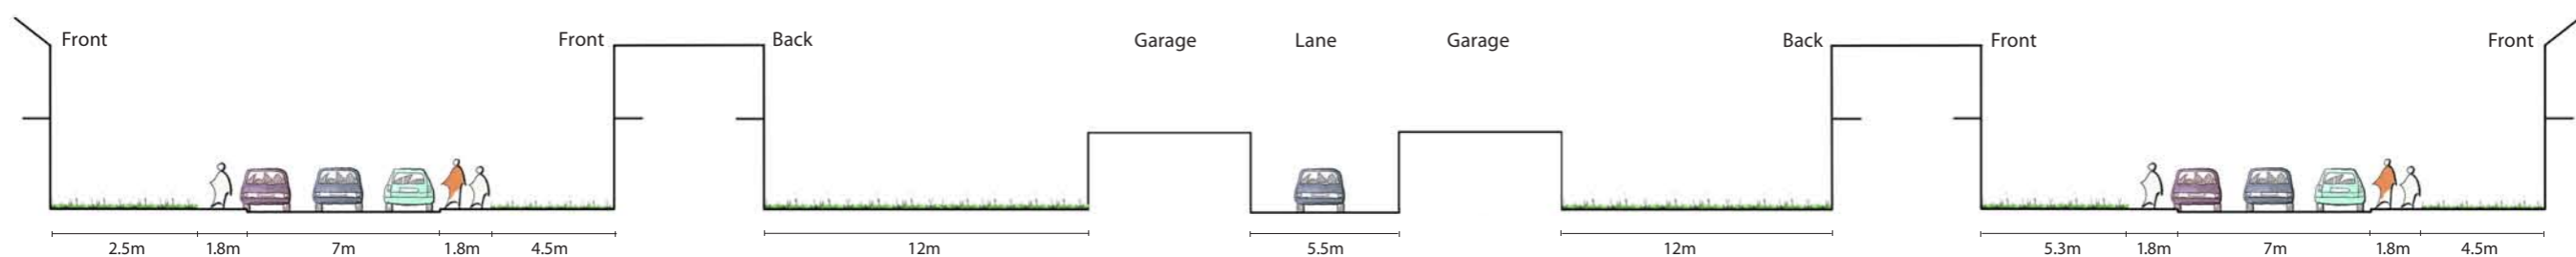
Section B cuts through the block demonstrating its internal layout where a semi-private lane provides access to rear garages
